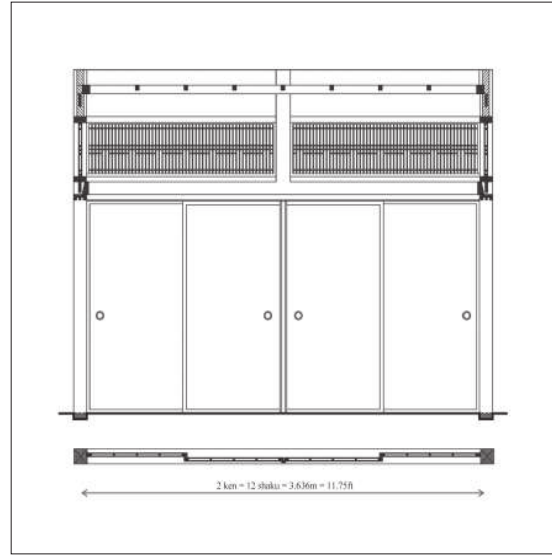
Elevation and plan of sliding panels with latticed transom ranma (Source: Reproduced by the author from Engel, 1964).
